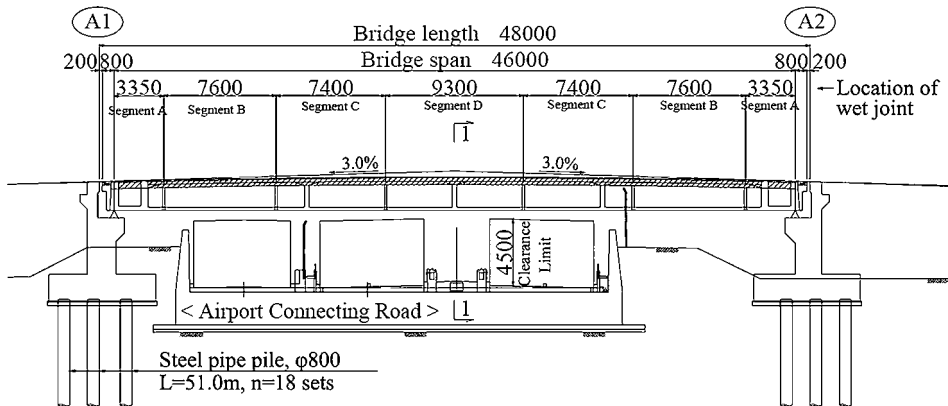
Longitudinal section through GSE Bridge showing the individual segments of the beams [148]
